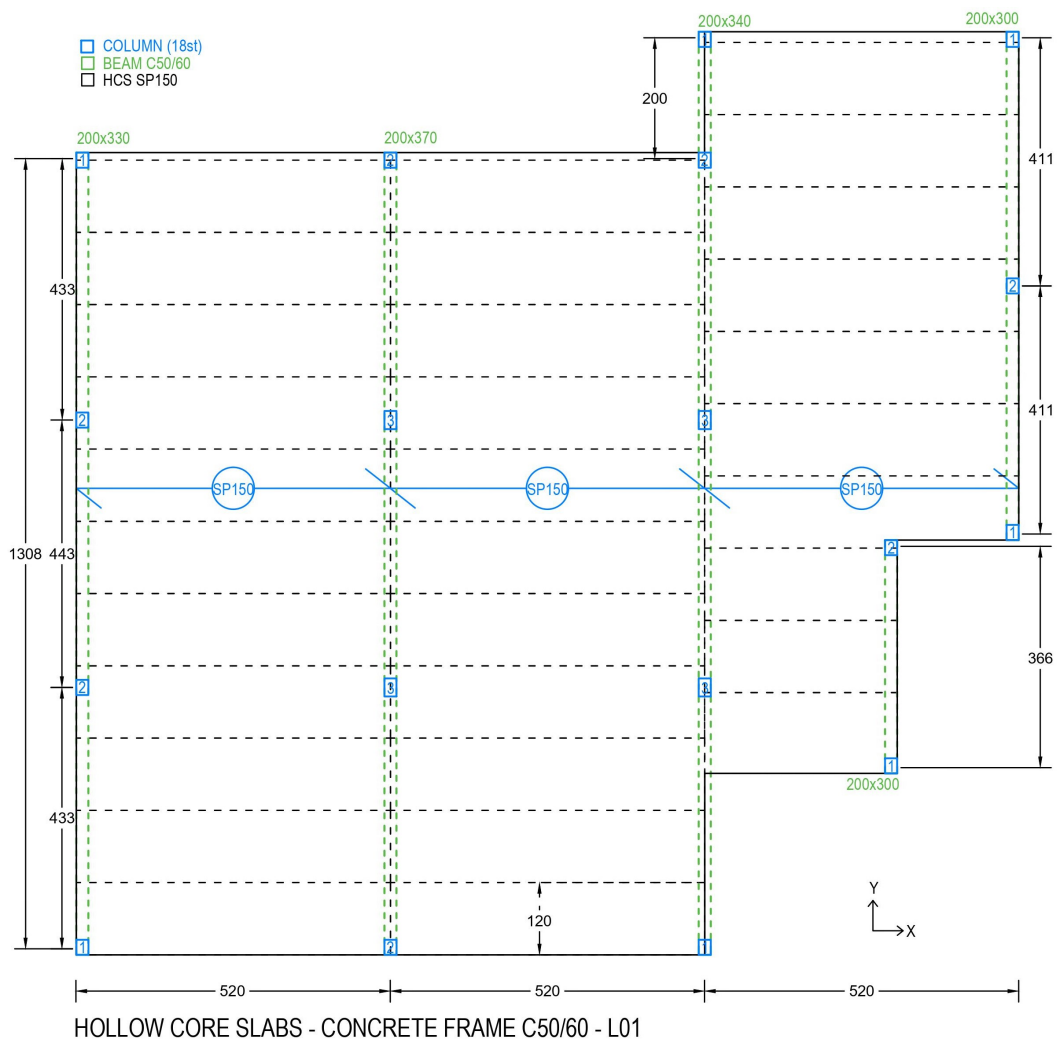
Conceptual structural design plan of the FU with HCS supported by a frame structure - L01
